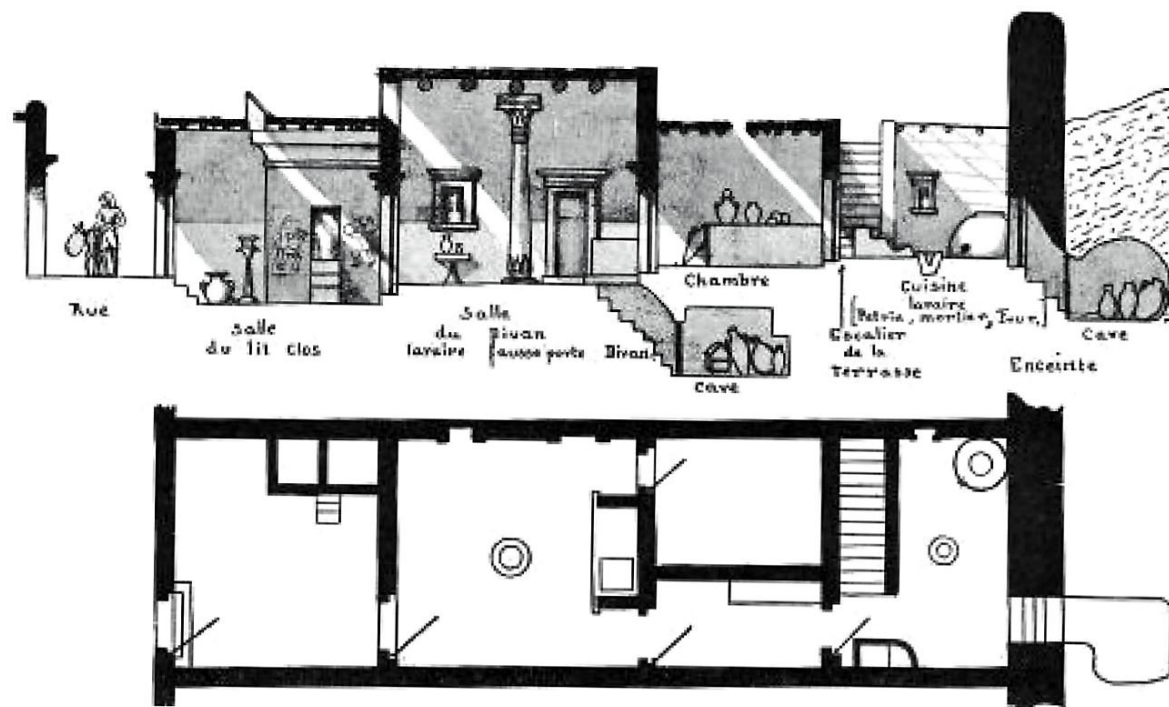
Standard house elevation and plan at Deir el-Medina (Bruyère 1939: 50, figure 15).
